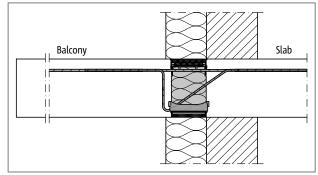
Schöck Isokorb® XT type K: Balcony with facade recess
